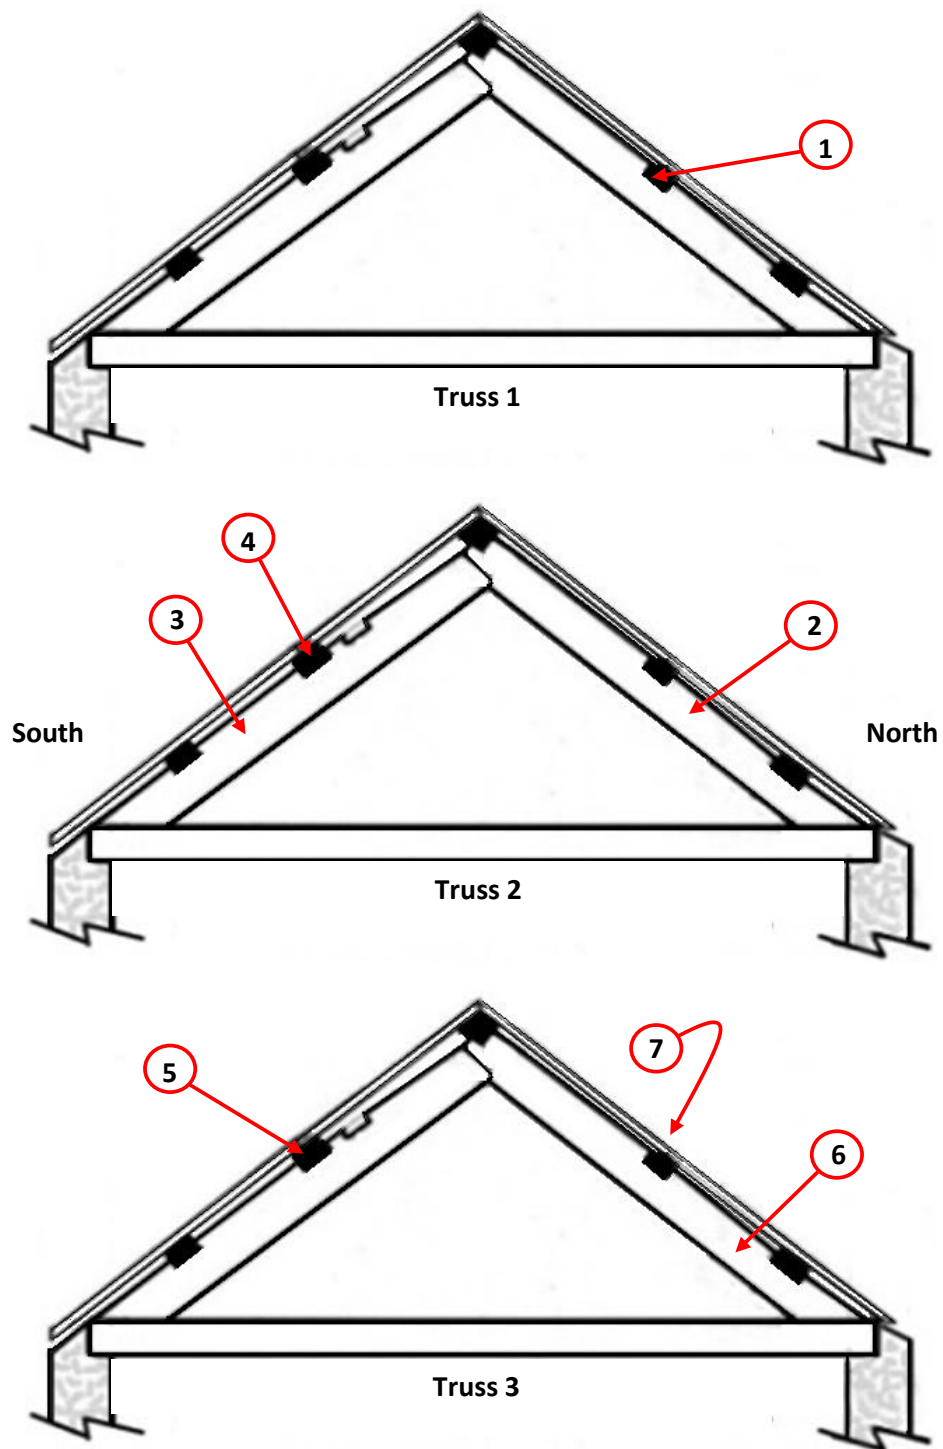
c: Sections through the front range roof to help locate sampled timbers (see Table 1) (after Cumbria Vernacular Buildings Group survey)
